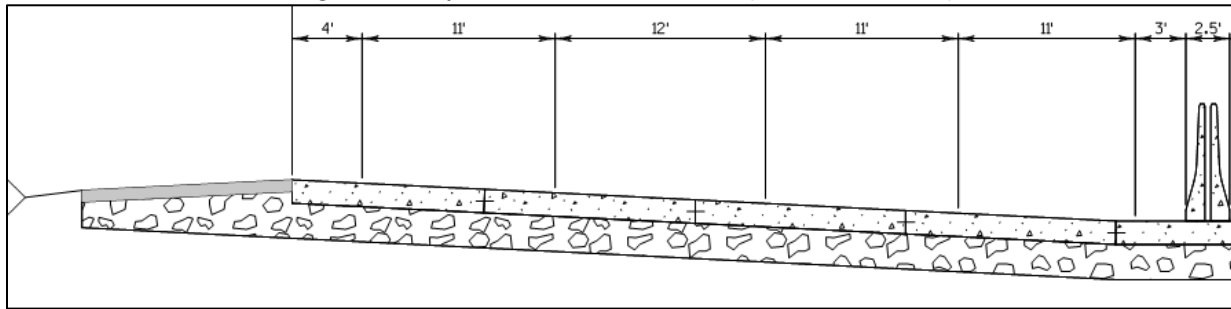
Proposed I-43/94 Cross Section B (National to Lapham Weave)
